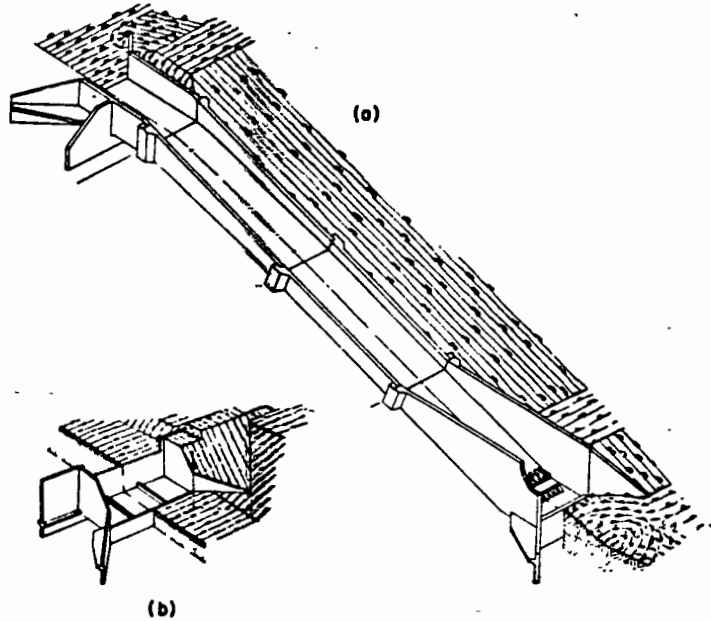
(a) Typical chute spillway with one wing wall cut away to show baffles. (b) Typical drop spillway.
